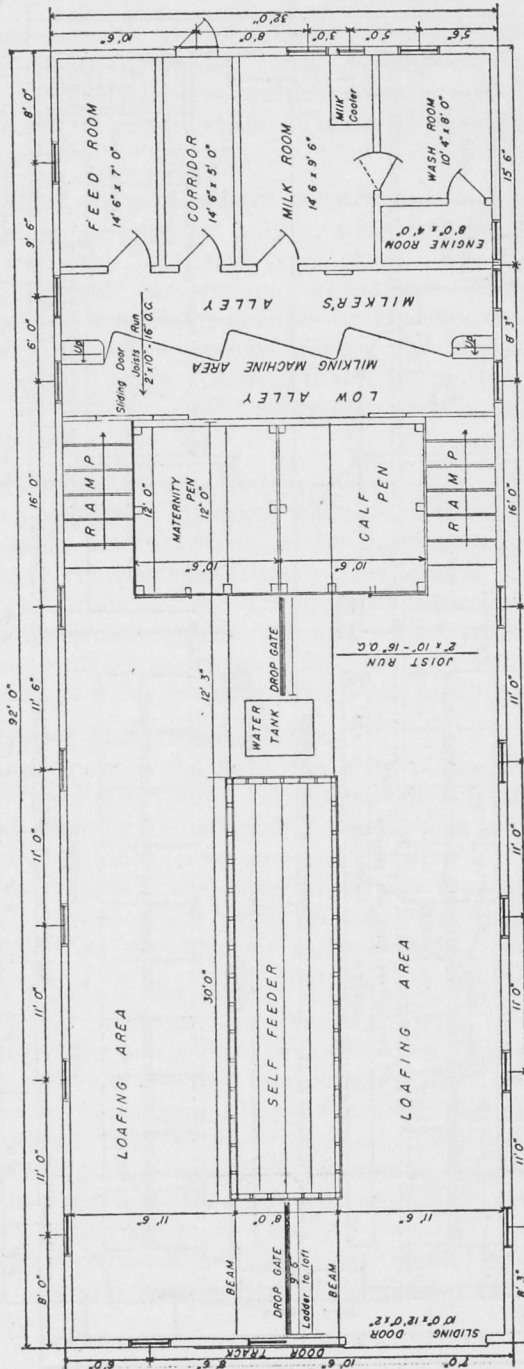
Milking Parlor and Lounging Shed Barn Plan. (Taken from plans prepared by the Provincial Department of Public Works.)
